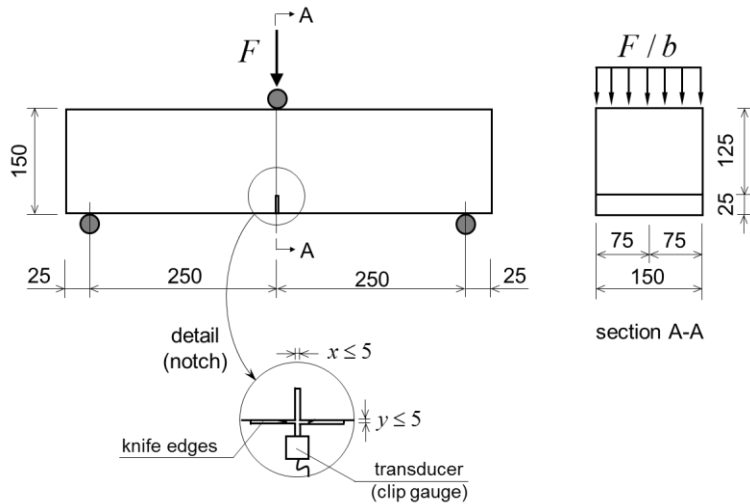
Test set-up required by EN 14651 (dimensions in [mm])
